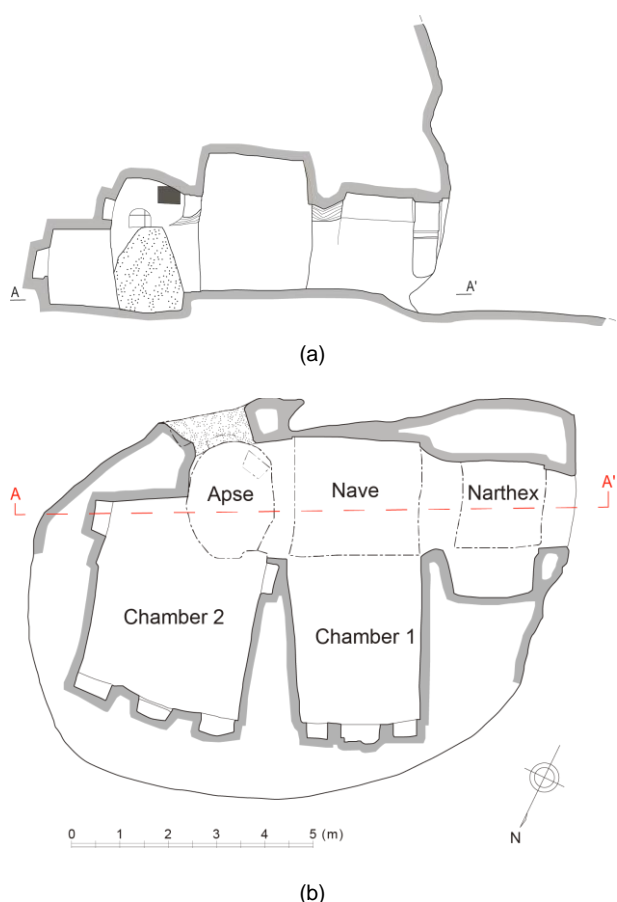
The drawings of the Üzümlü Church: a) East-west (AA') section; b) Ground floor plan.
